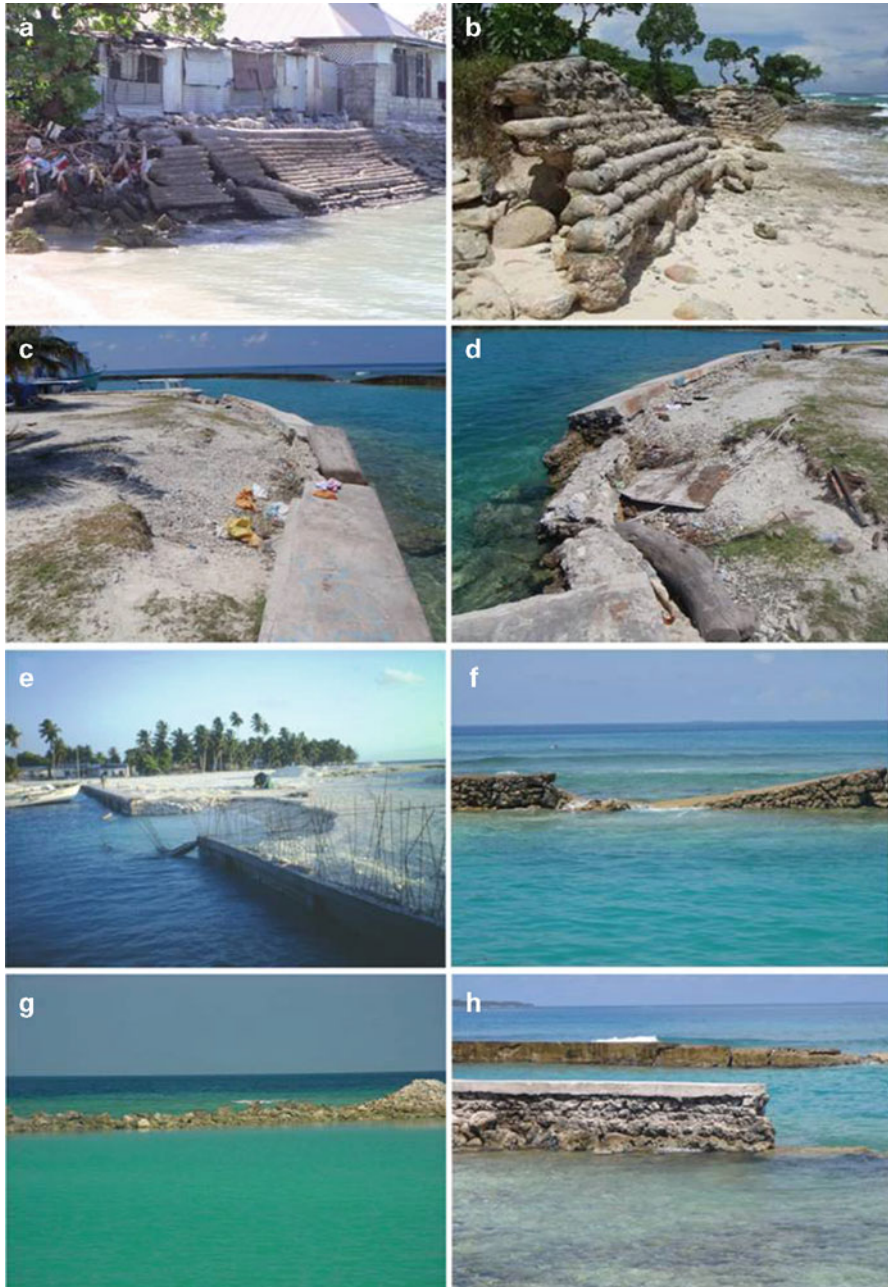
Examples of common failings of coastal structures in reef island settings. In most cases structures do not comply with the design considerations for structures. (a) and (b) Undermining and collapse of cement sand bag seawall due to overtopping and lack of geotextile. (c) and (d) Slumping of land behind seawall and collapse of structure. (e)–(h) Overtopping, breaching and failure of walls
